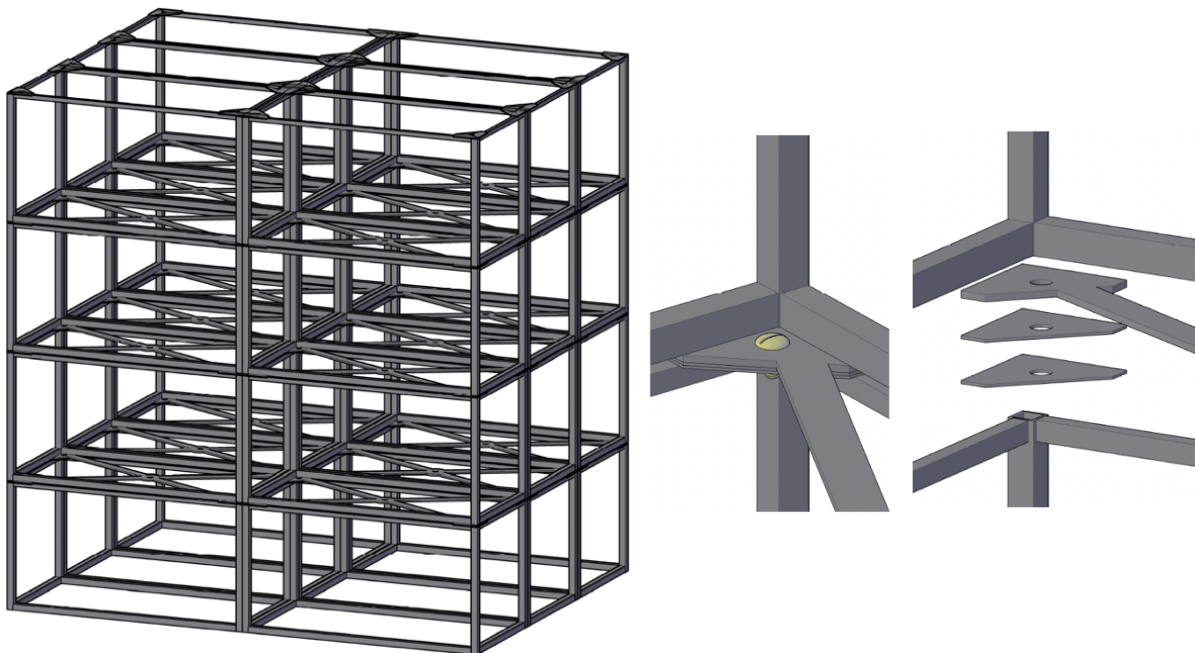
3D view of the scaled-down prototype (left) and the corner connections details (right).
